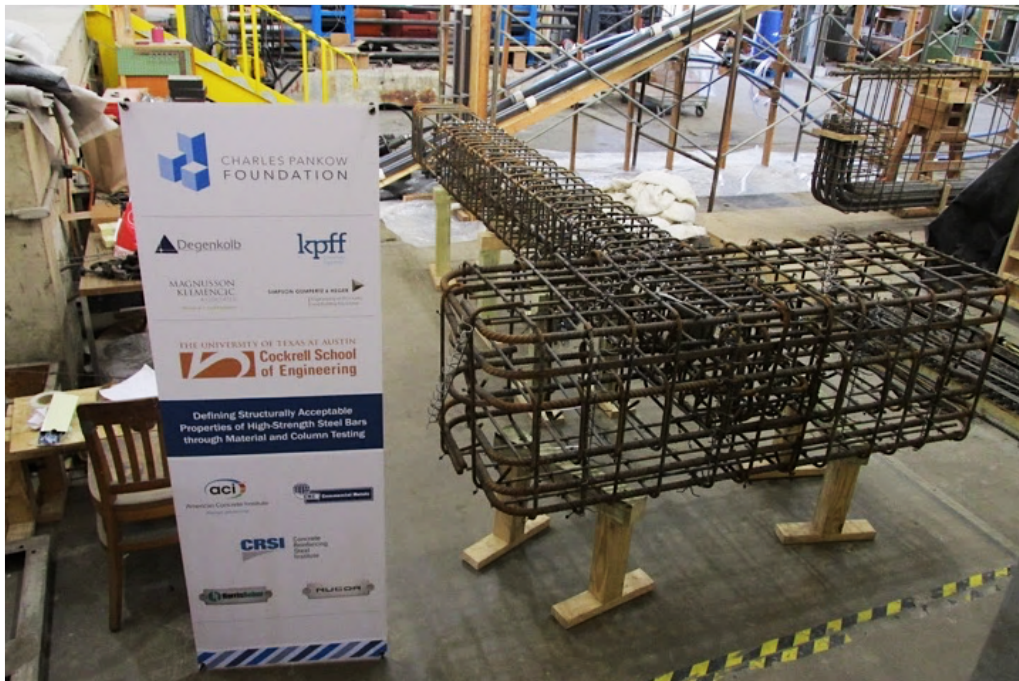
STEEL CAGE ASSEMBLY AND STRAIN GAUGE INSTALLATION
